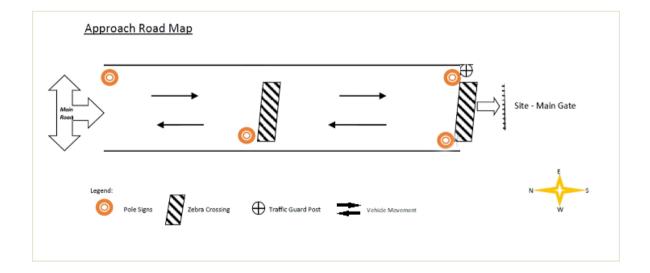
Offsite Traffic Management Plan for approach road to SAPL-RT
